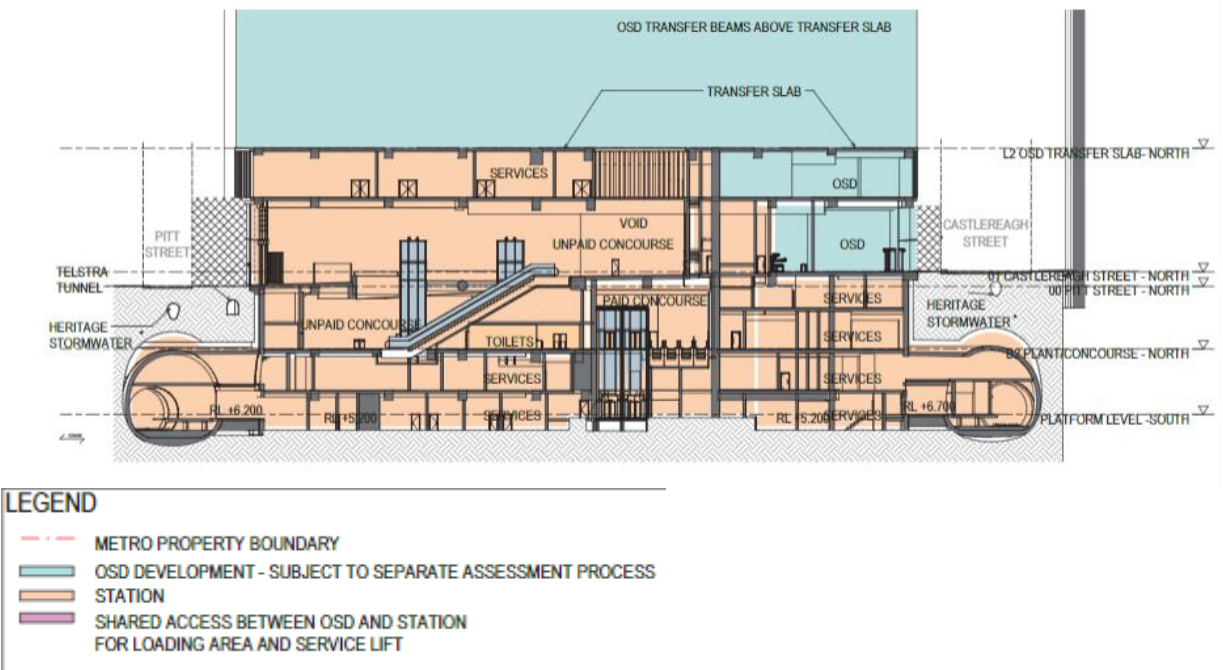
Pitt Street Station – North (East-West Section) (Source: CSSI Preferred Infrastructure Report (TfNSW))
